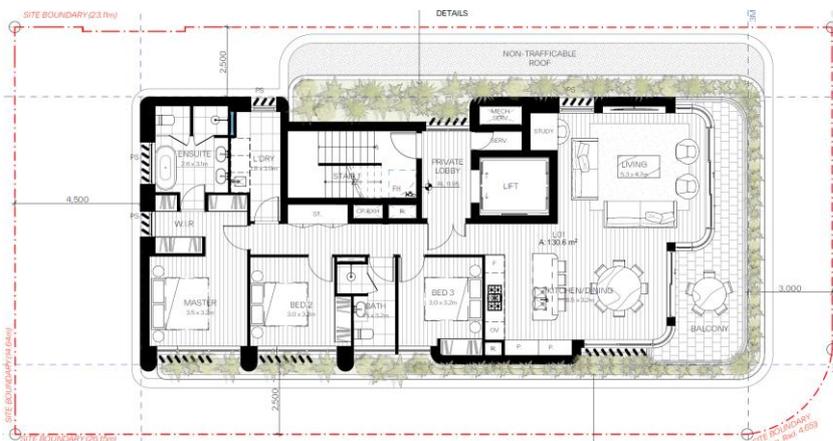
Proposed typical first-third floor plan – 8 Ormond Gardens, Coogee (Source: PBD Architects)
